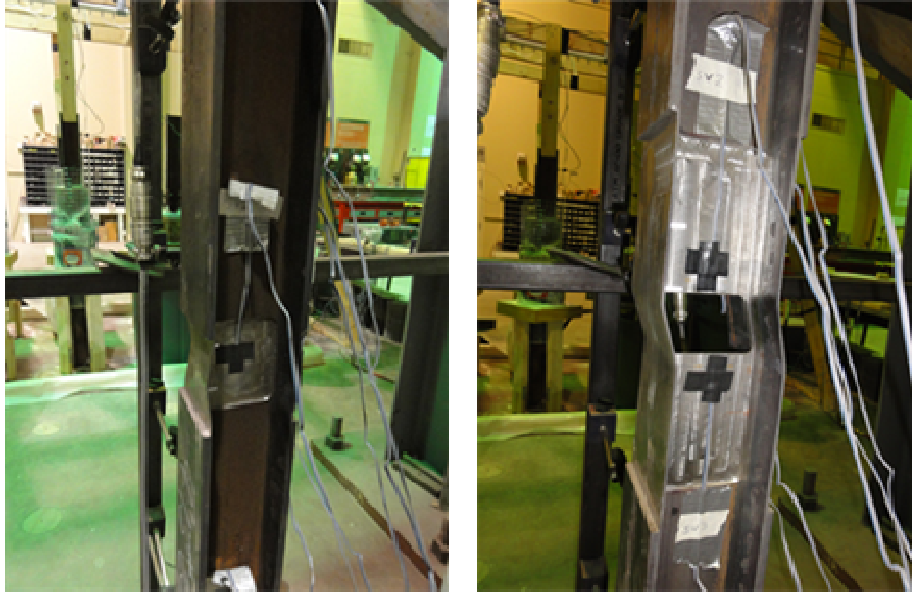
Failure of 4-in. damaged control piles (DCONT-4) and 12-in. damaged control piles (DCONT-12)
